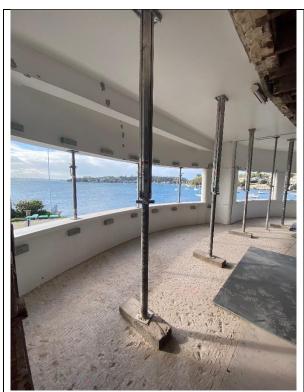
Internal, ground floor 1930s verandah with internal walls removed. (Source: GML, September 2024)
